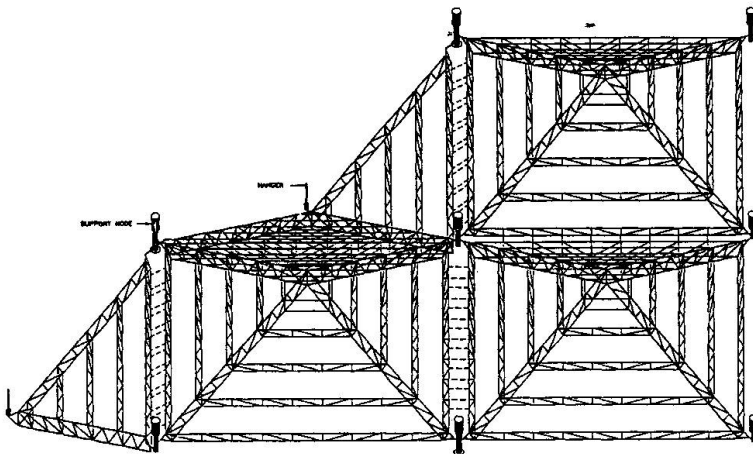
PART ISOMETRIC VIEW AT CORNER OF OPAQUE SECONDARY ROOF
